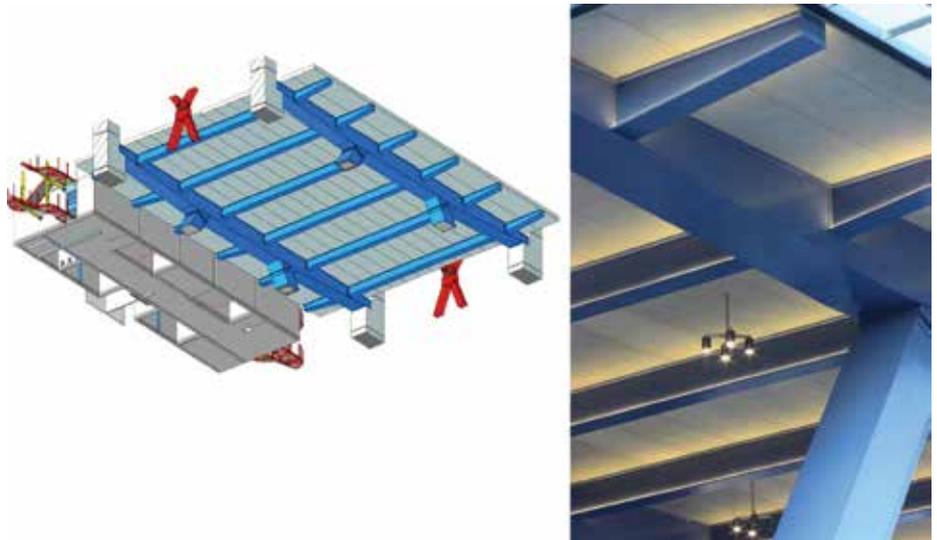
Reverse podium structural arrangement and completed structure (Source: Arup)
